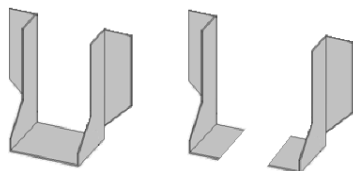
U-shaped beam shoe and L-shaped beam shoe.
